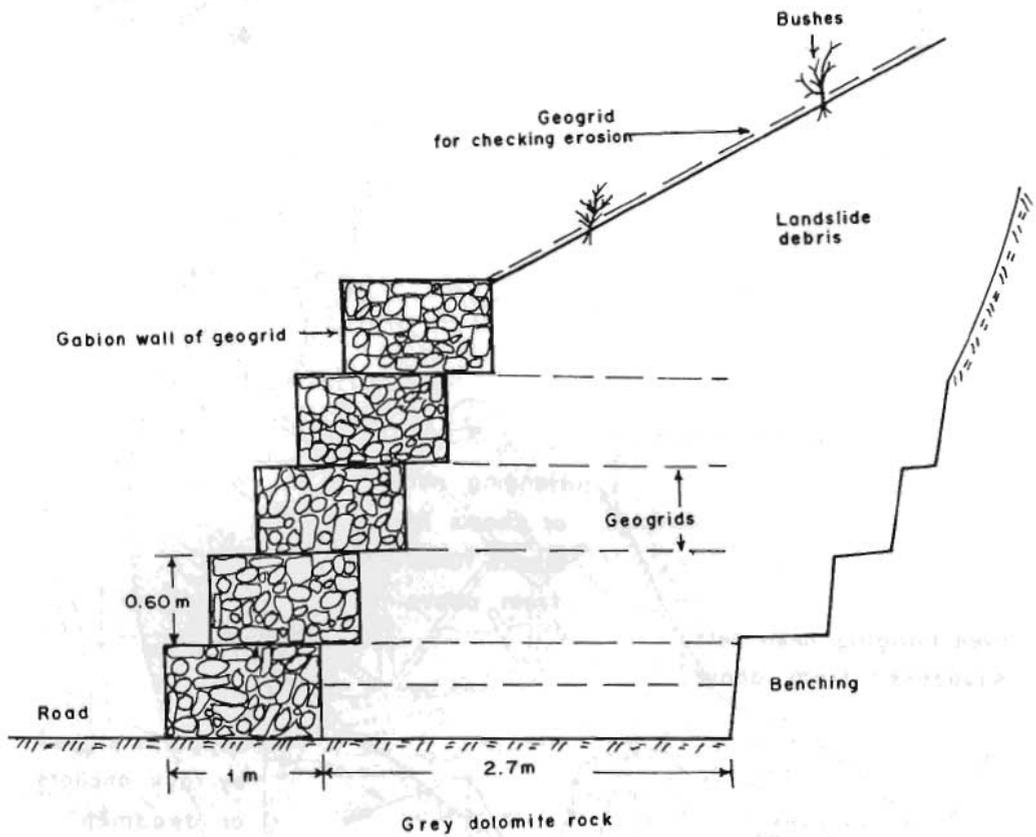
Stabilization of minor landslides by gabion breast walls
